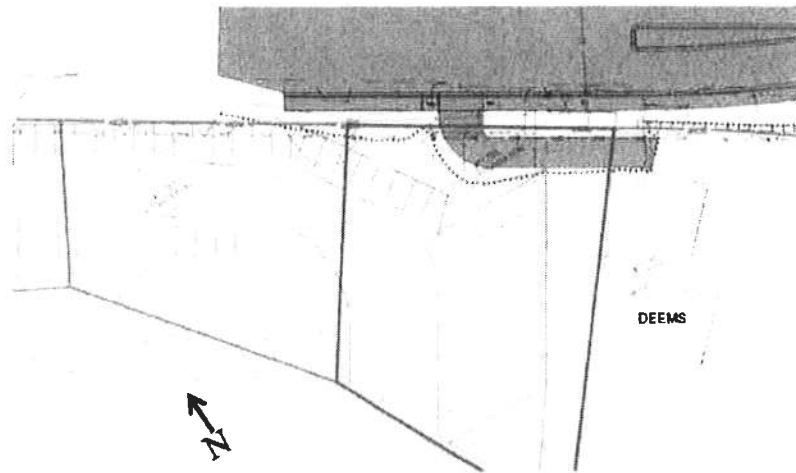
Excerpt of subject showing topography with the proposed road project overlay and the proposed standard harbor parking below. Note level lands at highway grade in the upper right corner.
